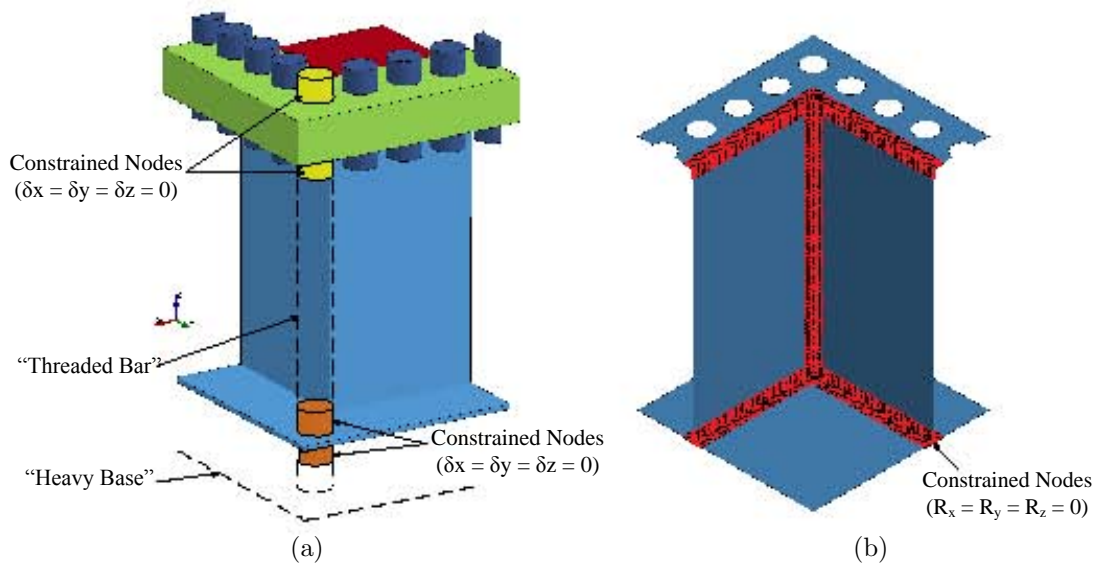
(a) Boundary Conditions Prescribed to Corner Bolts to Represent Threaded Bar and (b) Constrained Nodes Representing the Welded Joints
